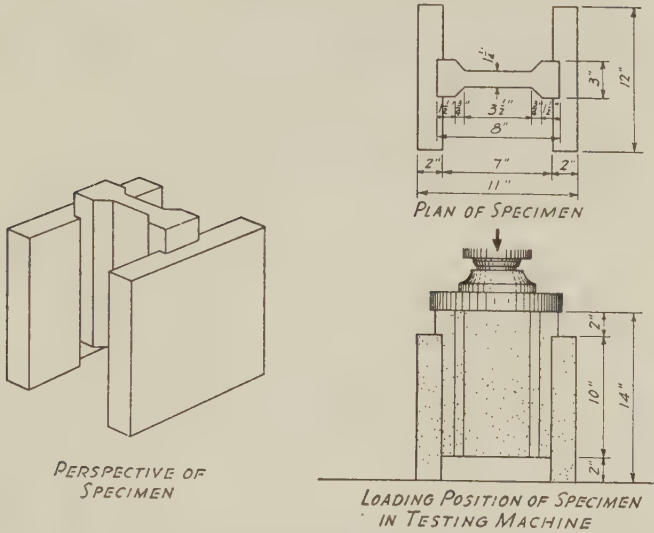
GENERAL DETAILS OF JOINT STRENGTH TEST SPECIMEN
